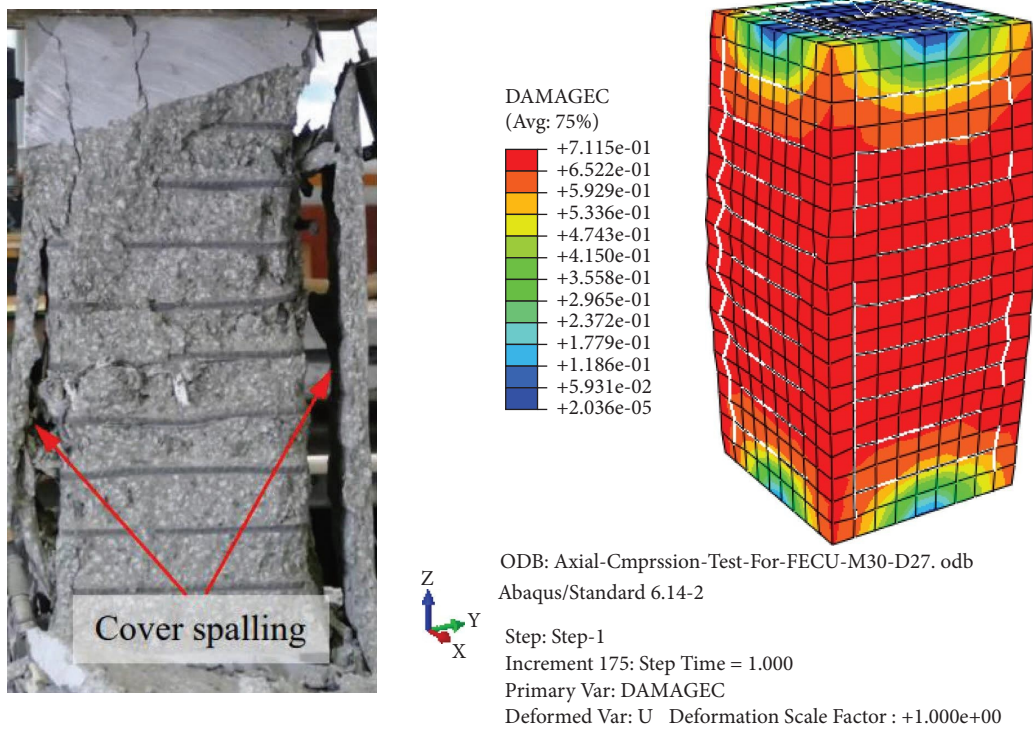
Concrete cover spalling of experimental and numerical column of [6].
